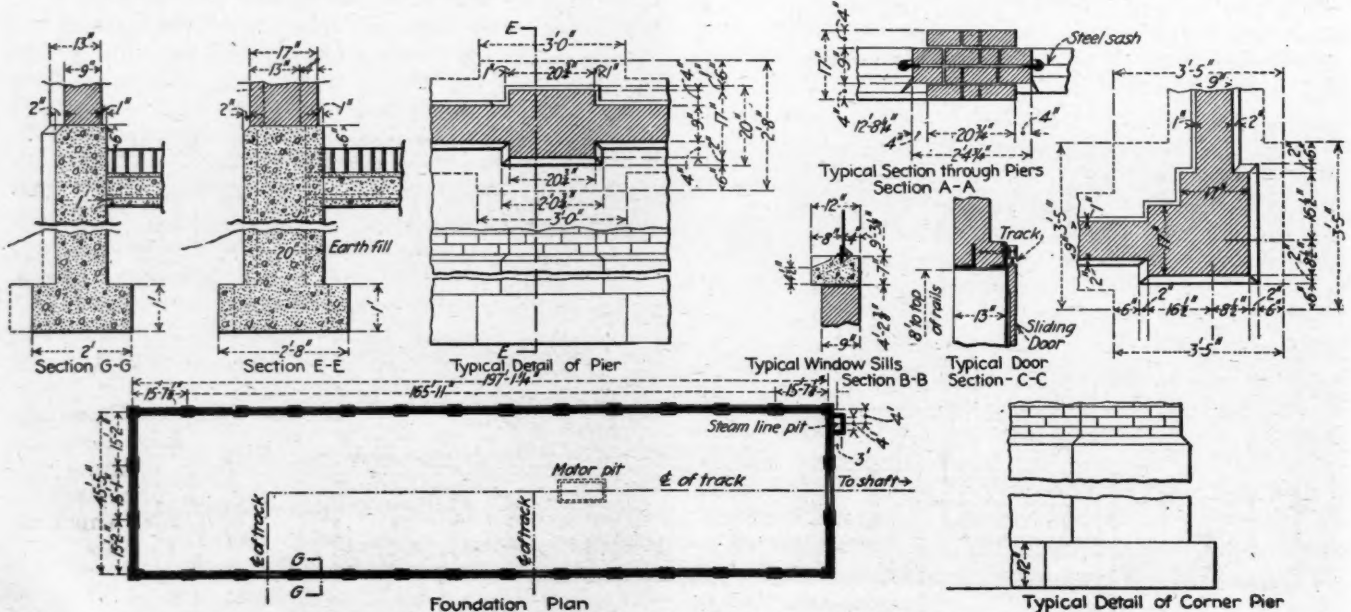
DETAILS OF FOUNDATIONS OF MACHINE SHOP WITH FOUNDATION PLAN
